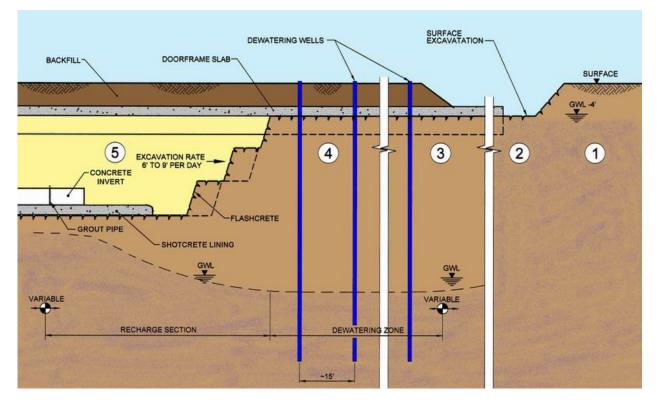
Proposed excavation sequence with dewatering scheme for JFK Airport Access Tunnel - New York, NY 1999
